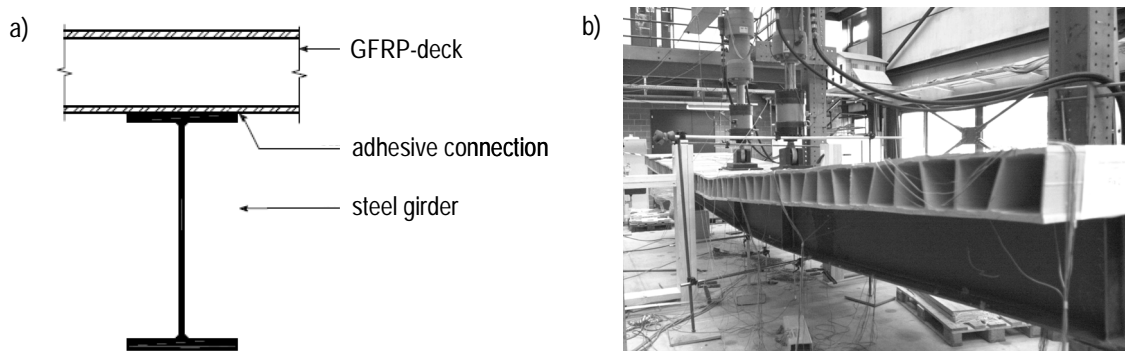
Hybrid GFRP and steel girder (a) cross-section, (b) deflection at the onset of failure, plastic hinge between the jacks (CCLab)
